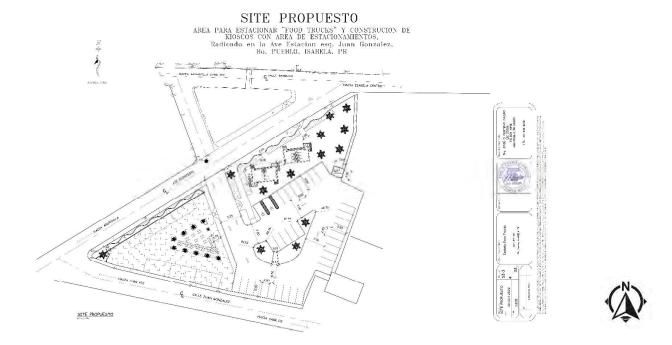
Proposed Site Plan, 13/October/2023 Set of Plans
